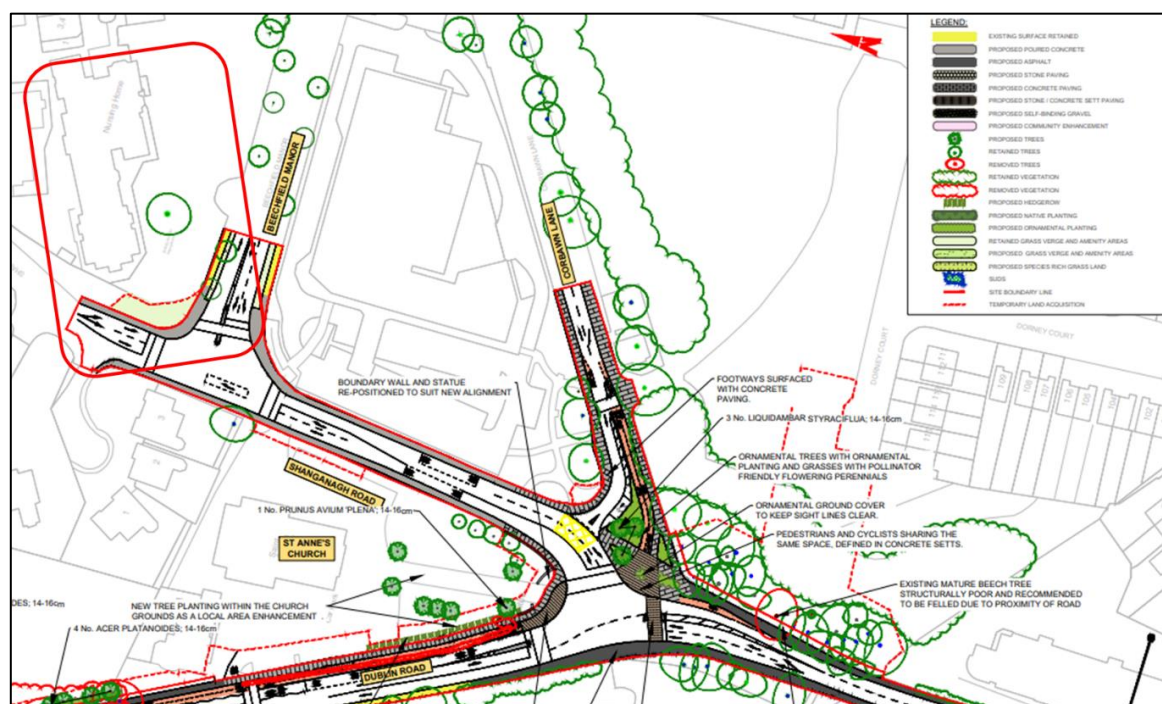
Extract from Landscaping General Arrangement Drawings at Beechfield Manor (Sheet 43)
